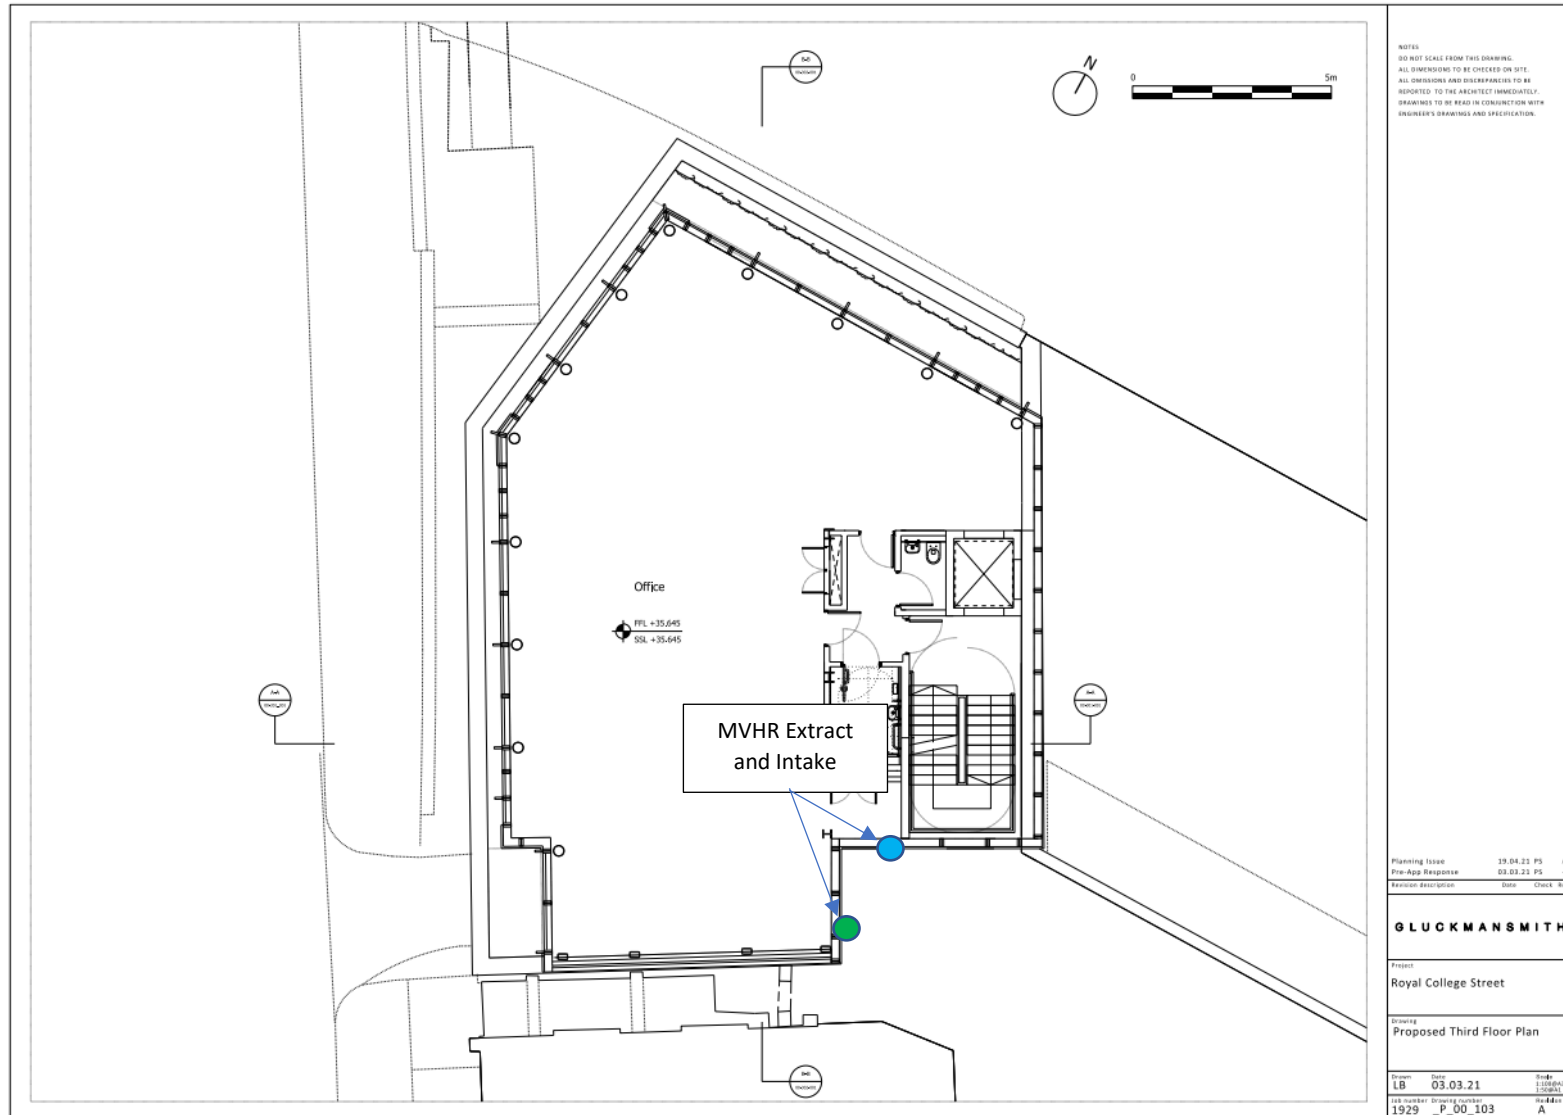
PROPOSED THIRD FLOOR PLAN
